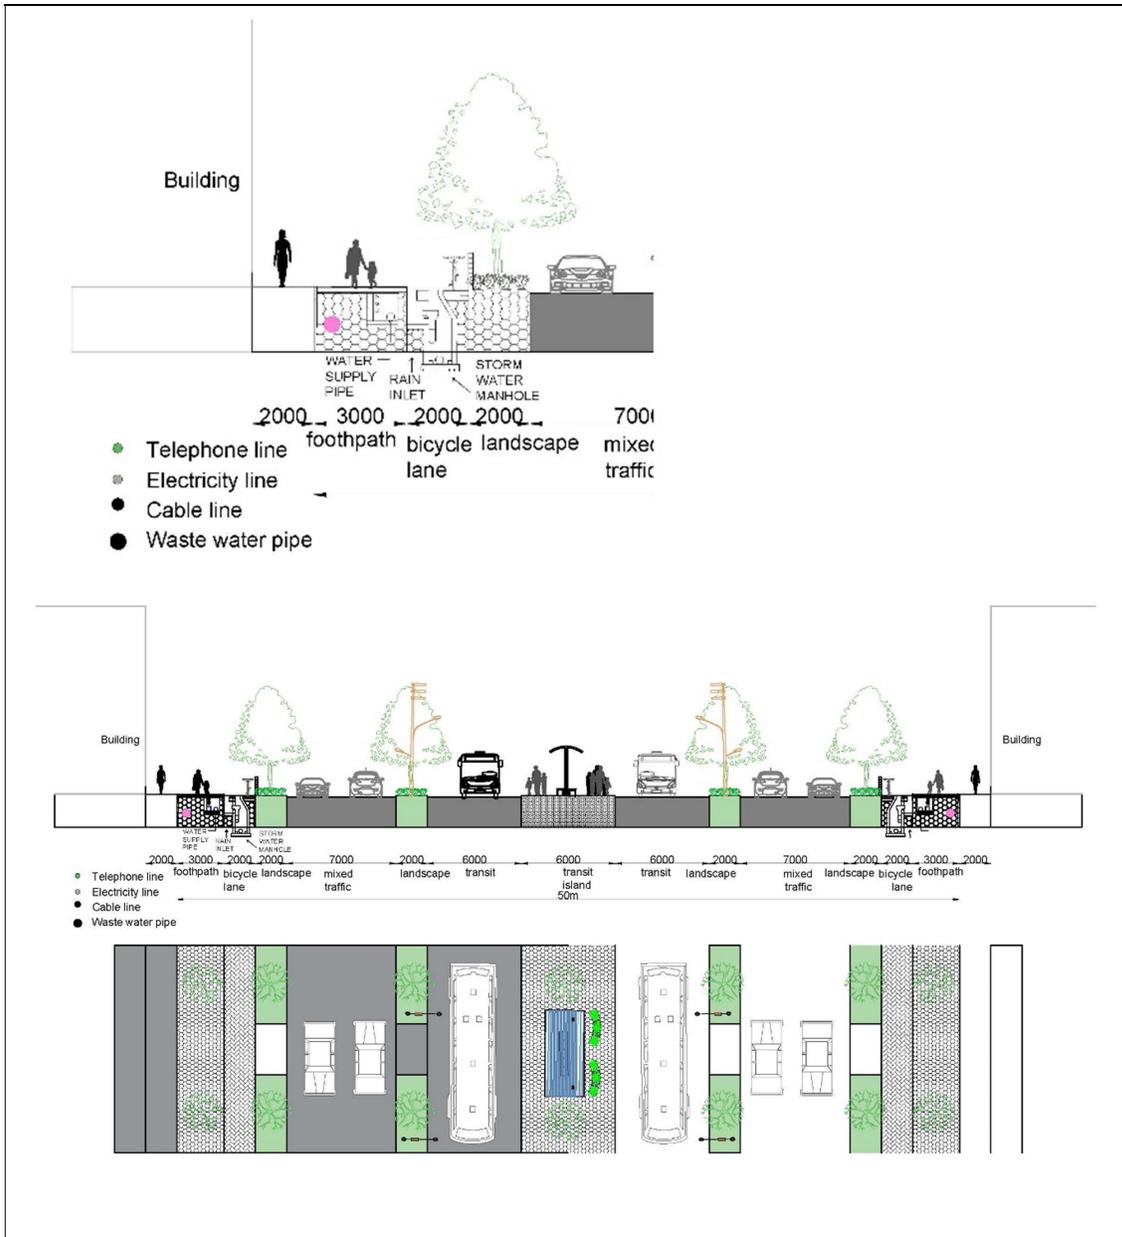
Possible Tunnel Layout for LPCC along entire road for utility services. Above style Utility tunnels can be made at the center of 50 meter road or at footpath, while along footpath for other smaller width road.
